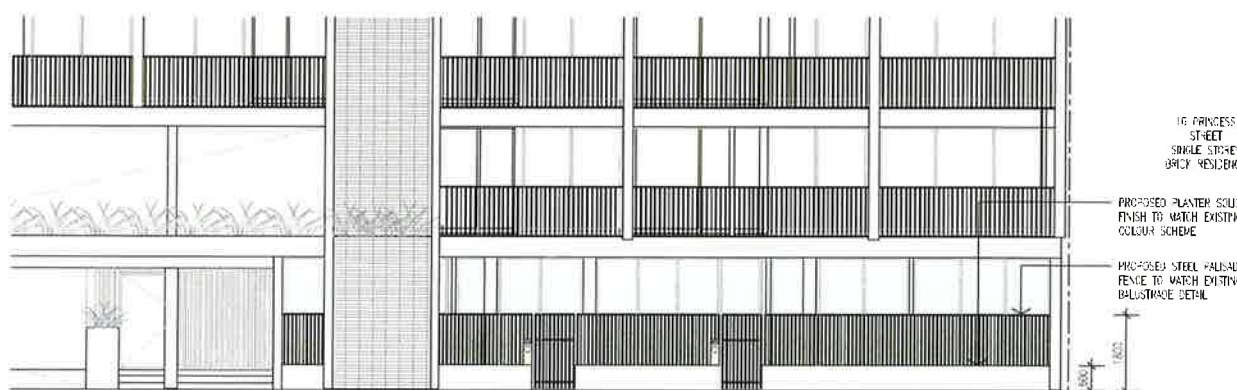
Princess Street elevation plan (Source: SJB Design Report)
